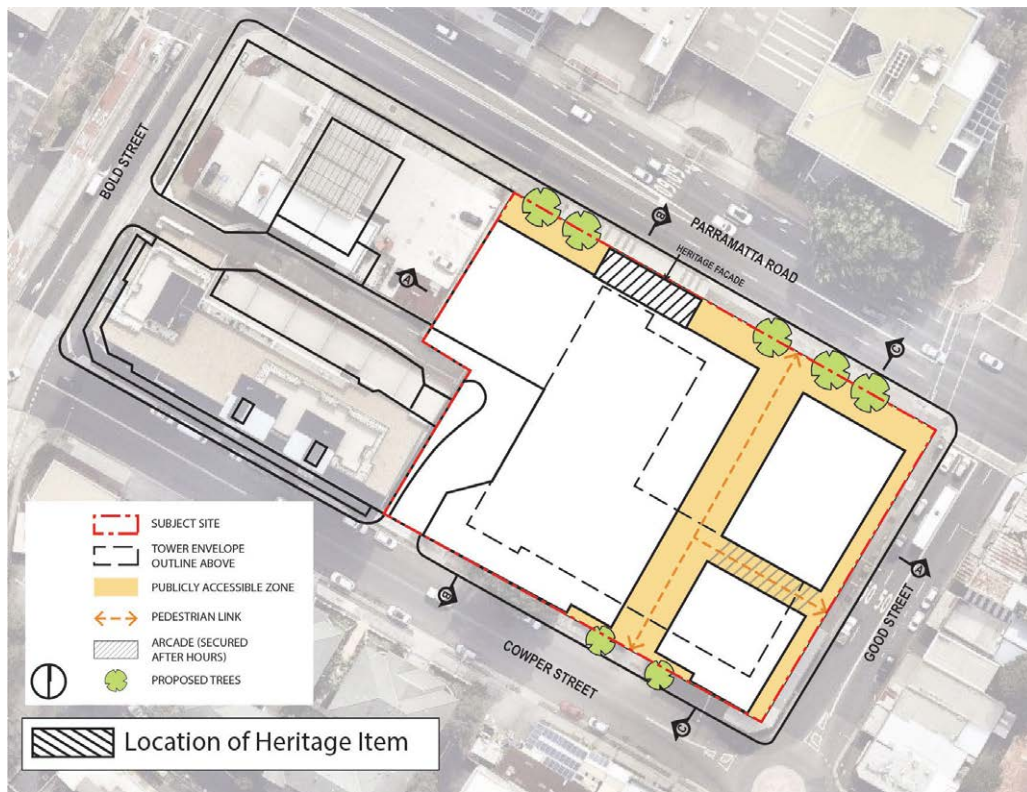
Publicly accessible zones and tree planting locations
